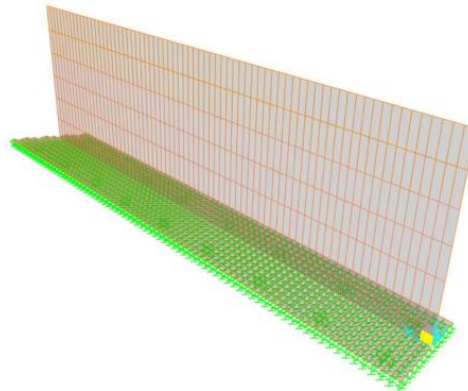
Modeling of 18 Meter Retaining Wall Structure
